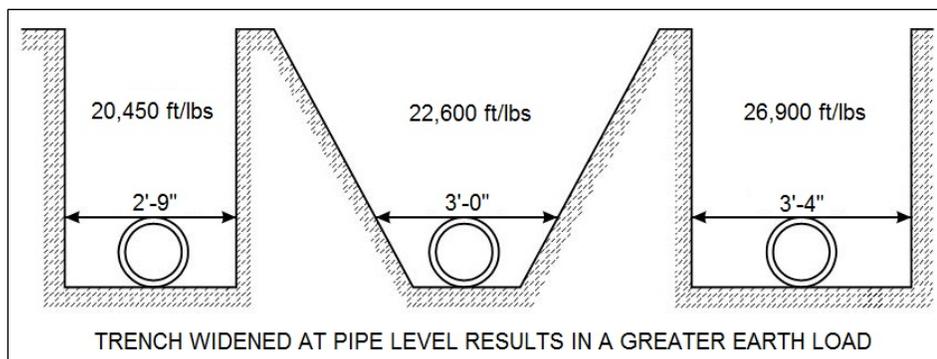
7: Trench Widening Parameters with Widening at Pipe Level
